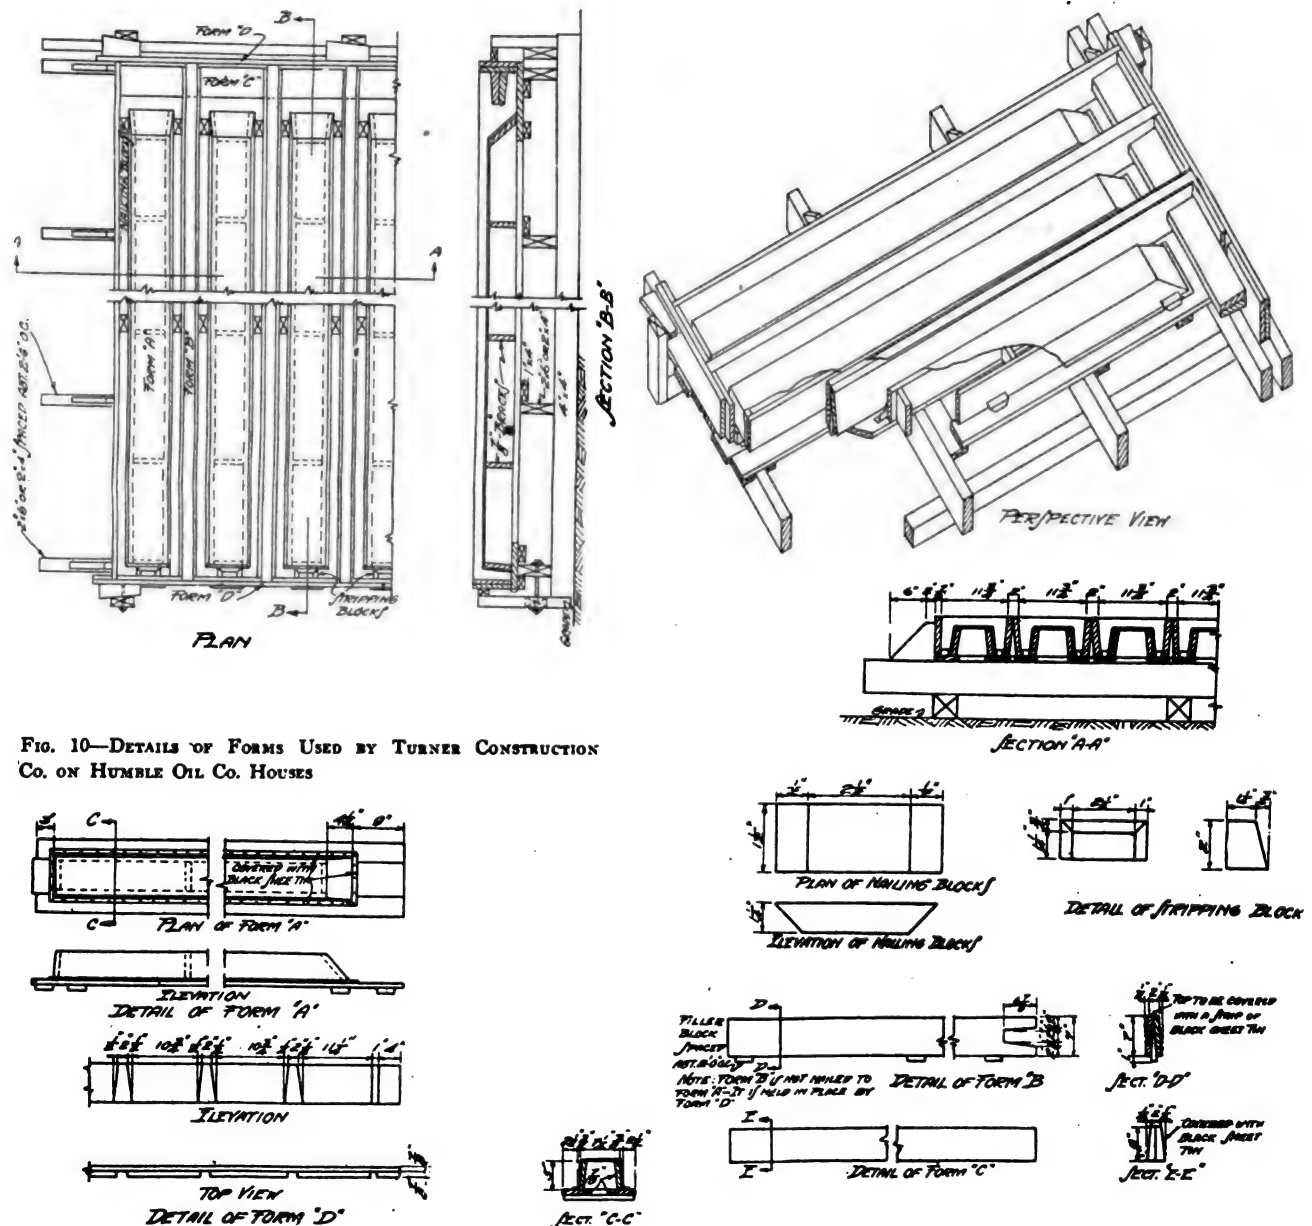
DETAILS OF FORMS USED BY TURNER CONSTRUCTION Co. ON HUMBLE OIL Co. HOUSES
